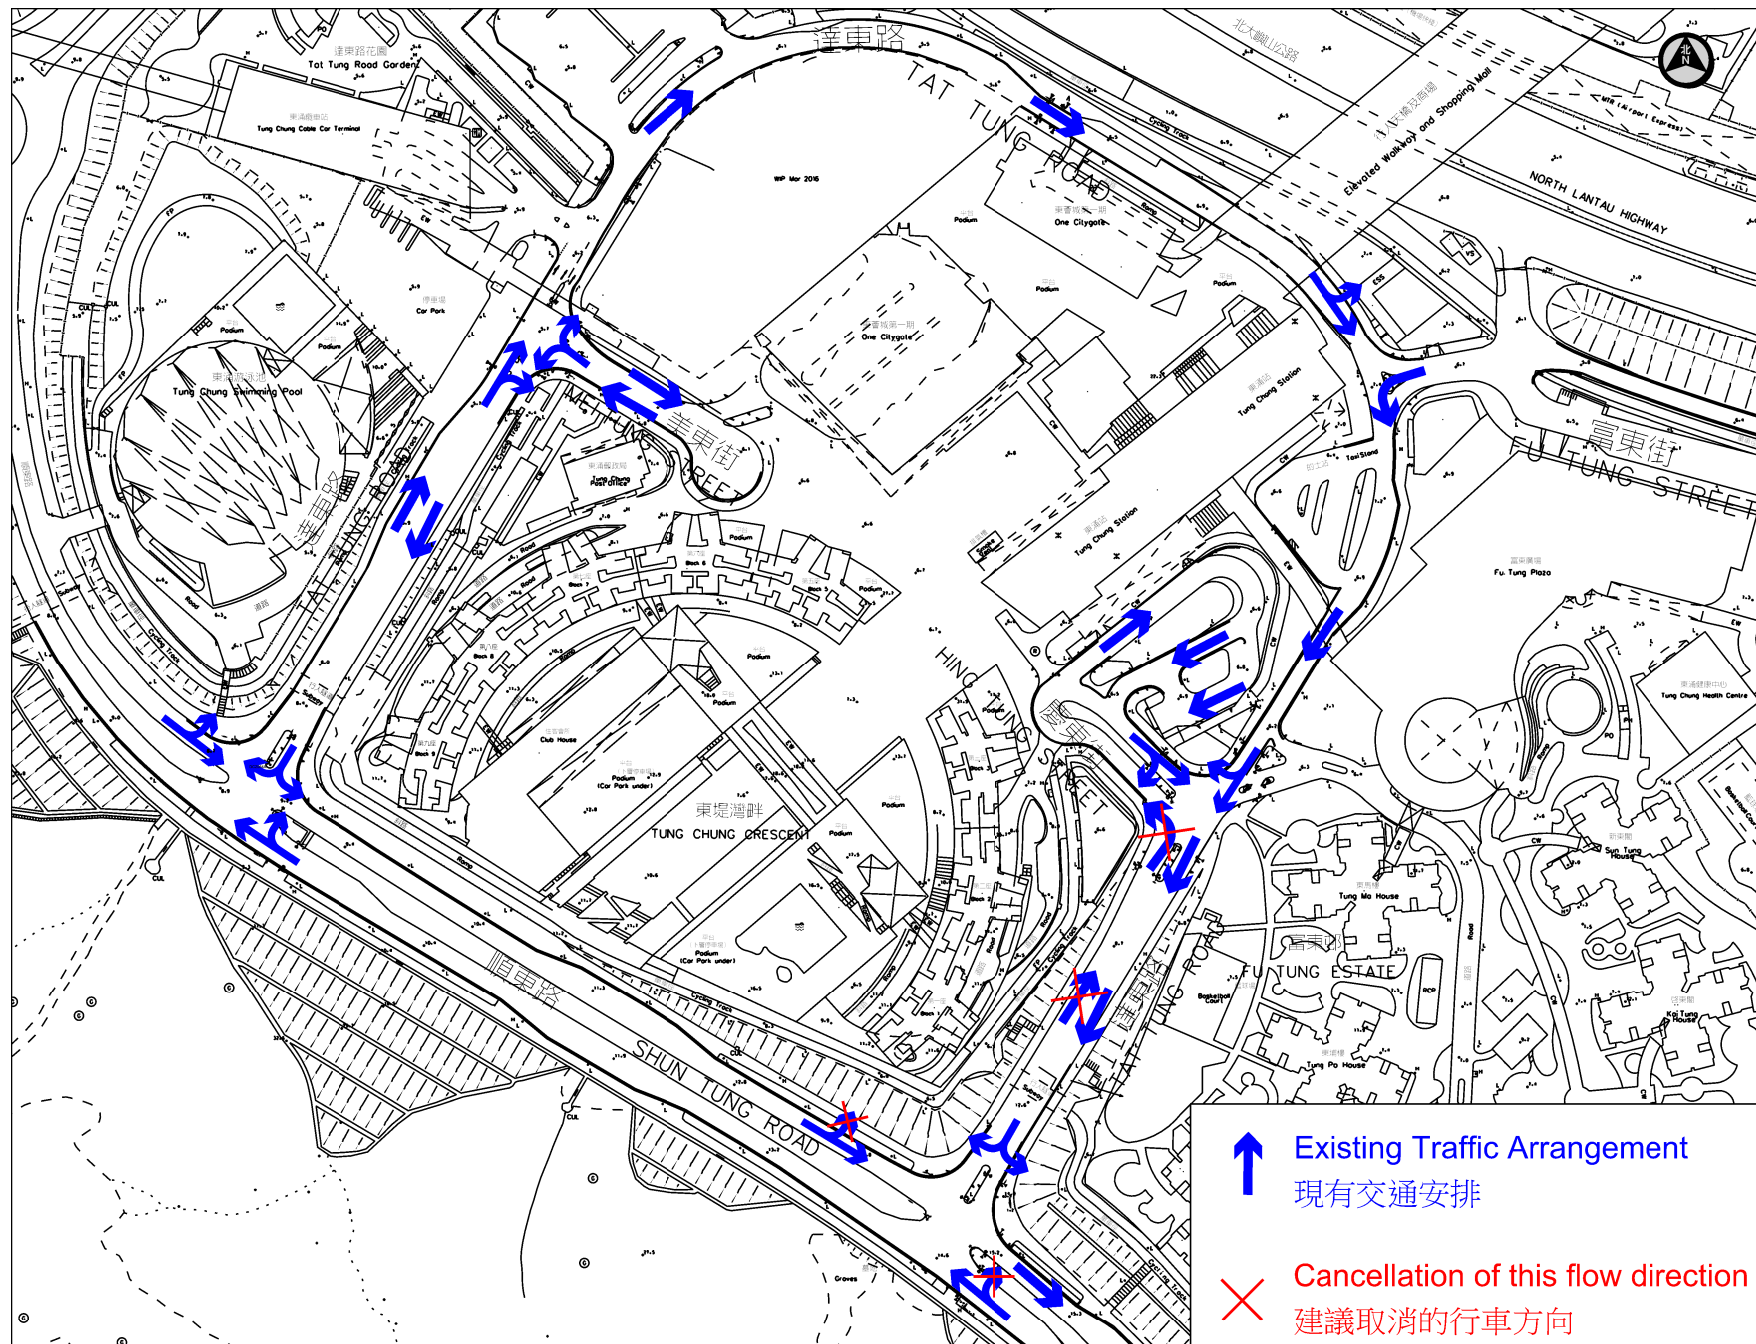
Proposed conversion of a section of two way road at Tat Tung Road between Shun Tung Road and Hing Tung Street to one way road
